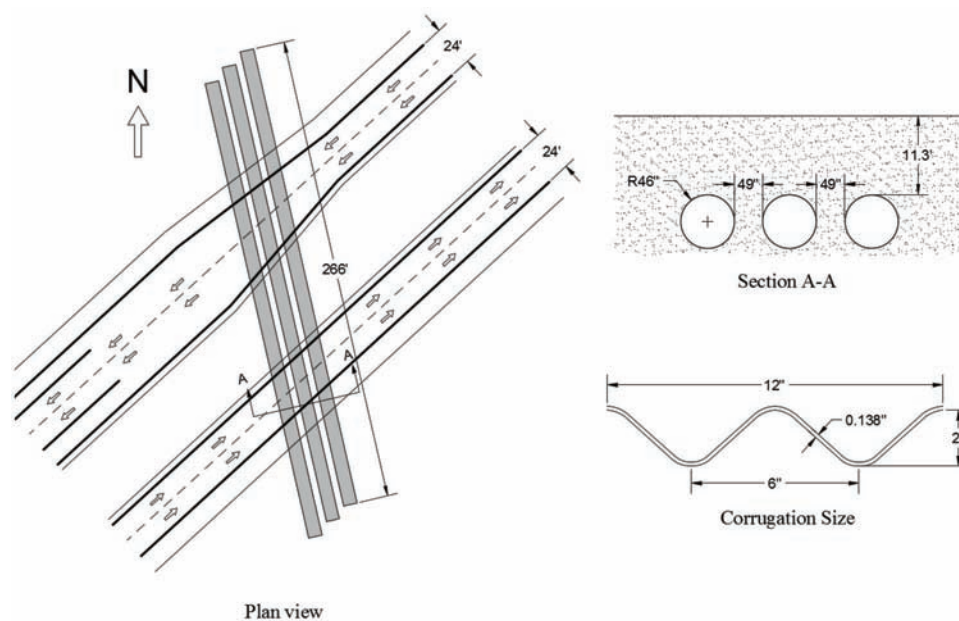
Corrugated steel arch plan view, cross-section elevation, and corrugation size.
